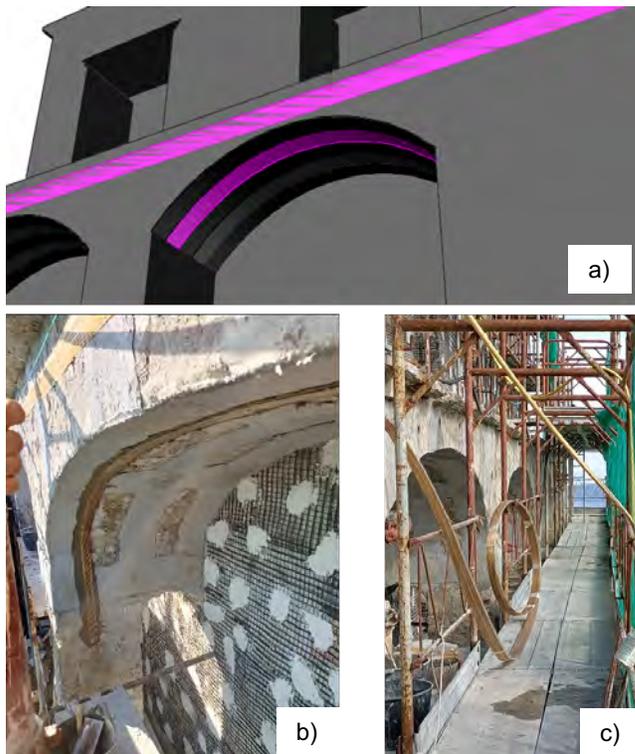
NSHT transducer a) intrados of arch installation b) façade installation (Source: Authors 2022)
